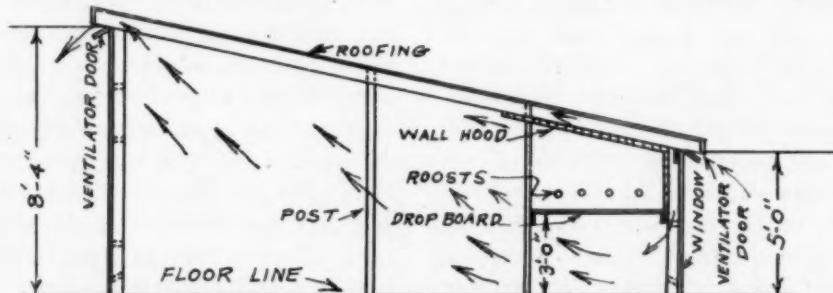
Showing One Plan of Ventilating for Poultry House Without the Use of a Roof Ventilator, But Requiring a Double Wall
